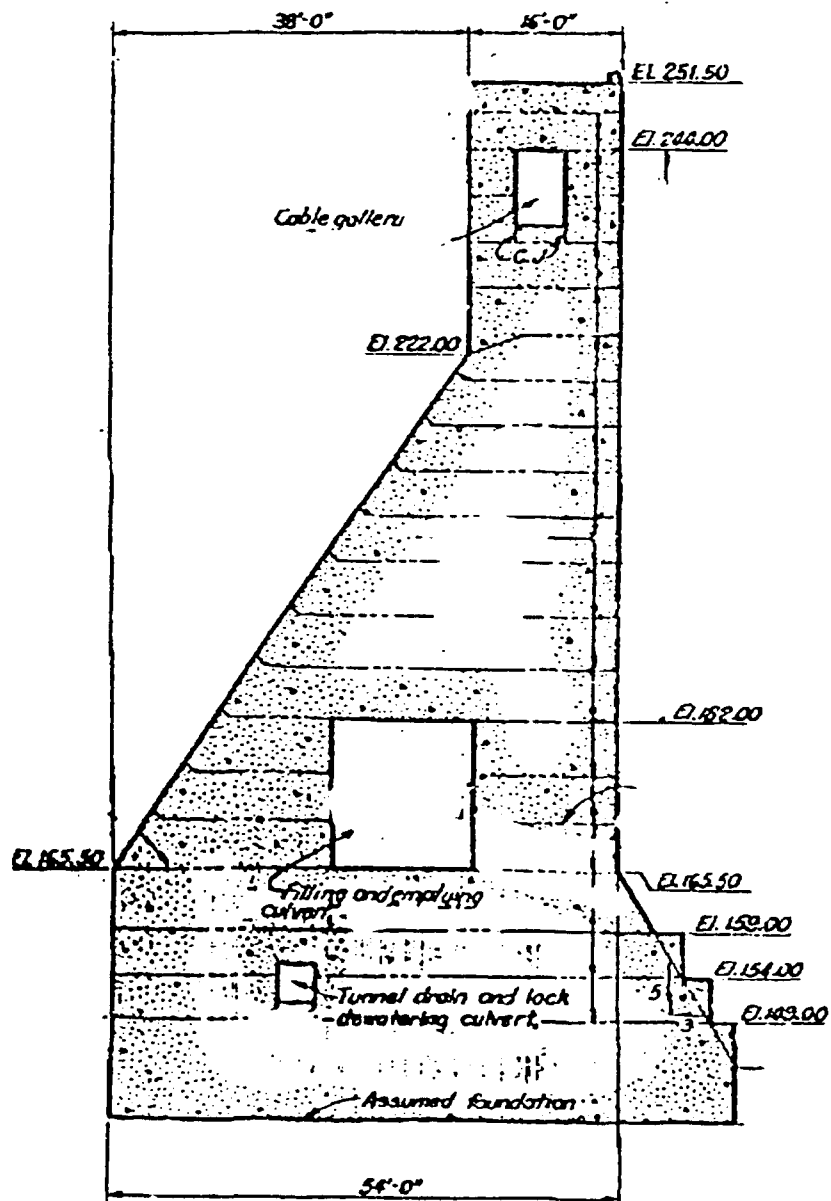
Typical cross section of chamber wall monolith on the north side at Eisenhower Lock
